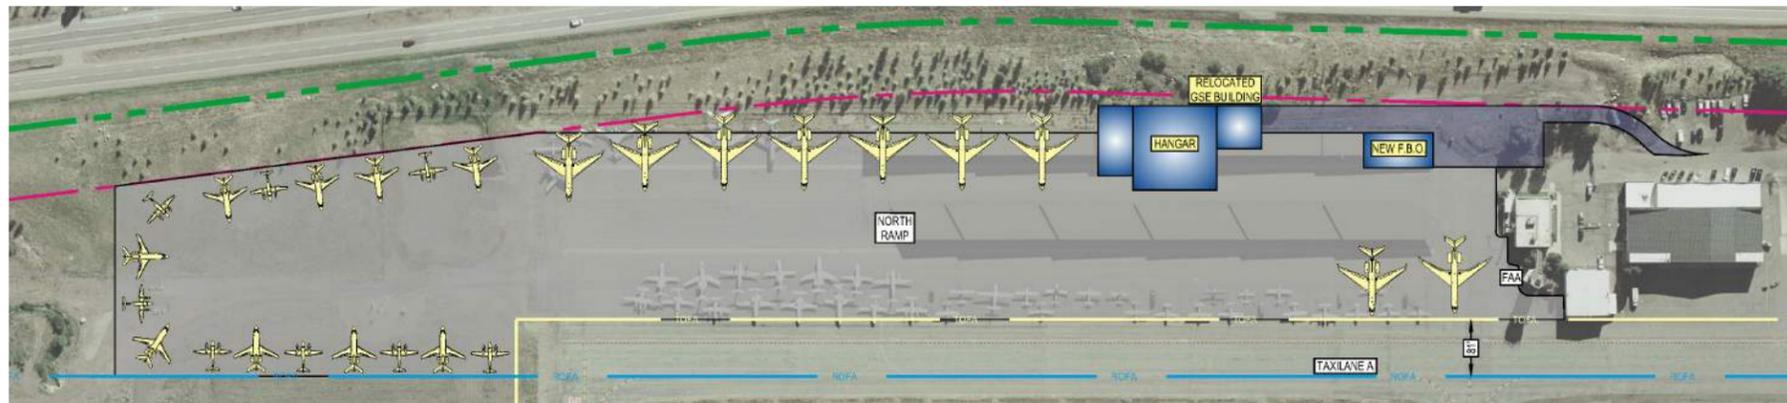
West Side Ramp for Small GA Aircraft (Appendix D, Alternative 11, Sheet 6 of 25)
